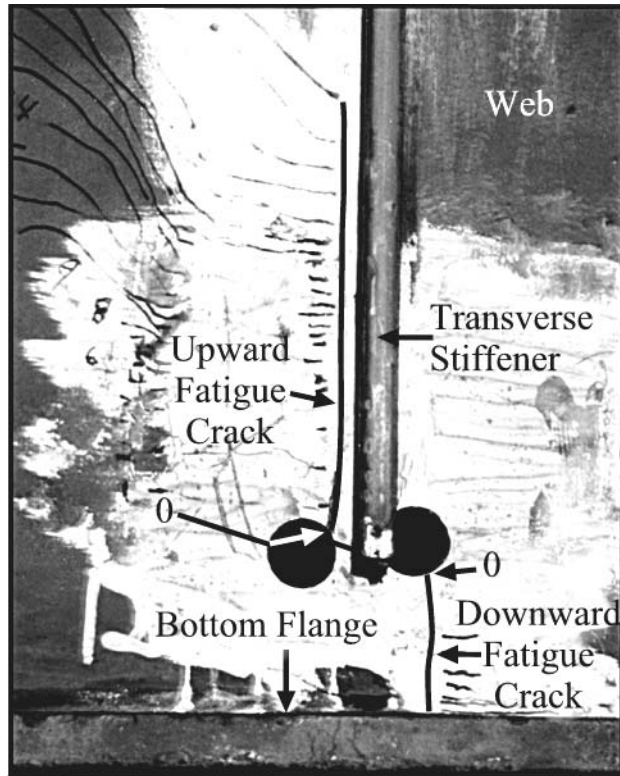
Fatigue Crack on West Face of Joint 12, Specimen 1
